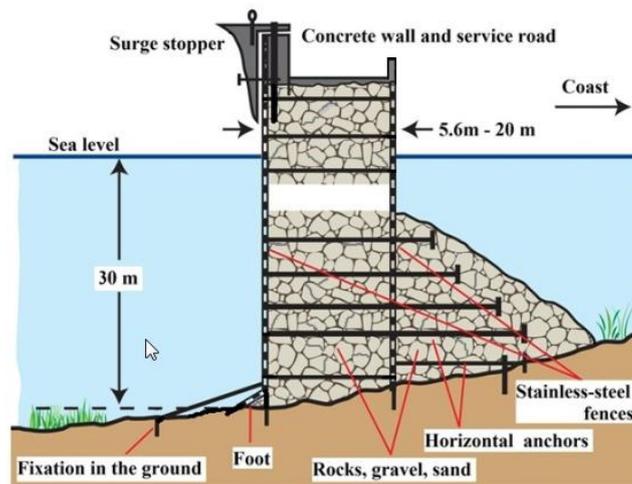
Double-fence tsunami-flooding-barrier with concrete service road, concrete walls and surge stopper, schematic cross section
